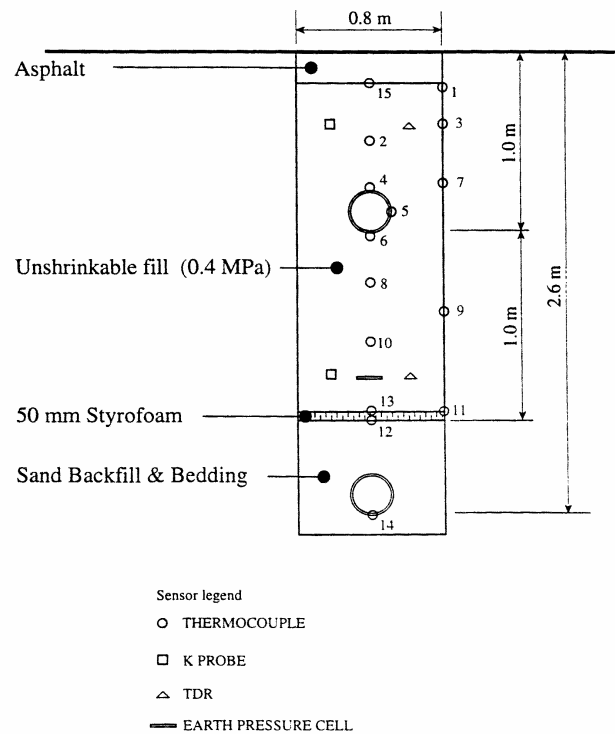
Backfill materials and sensor locations for test section E with sand and Styrofoam board
